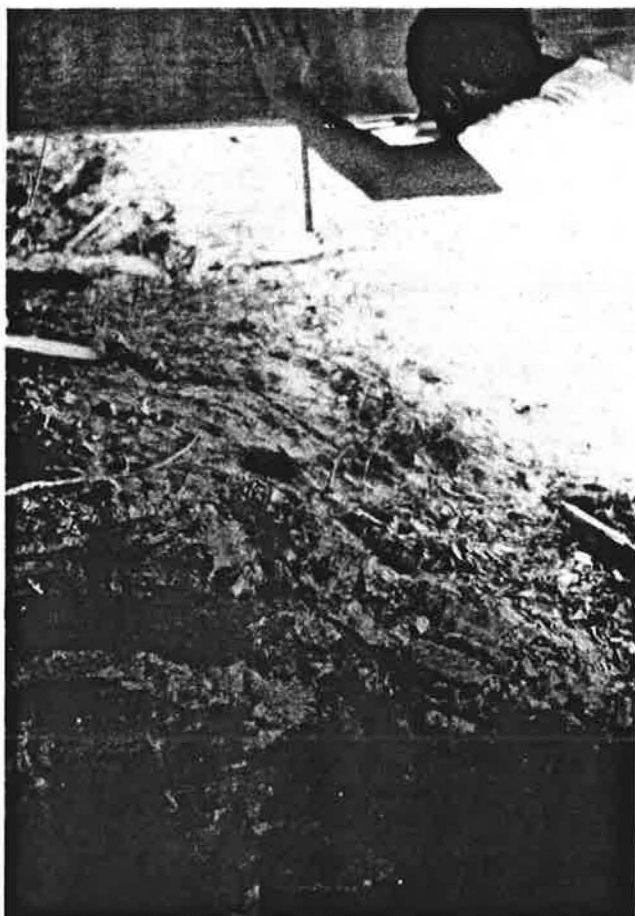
Pile stub remaining after removal of section below pile cap.
